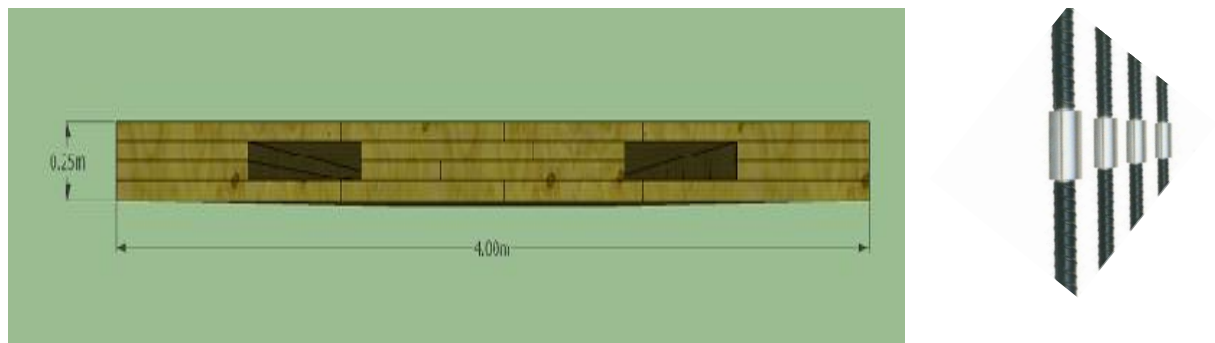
(a) Cross section and LVL shear wall (b) MacAlloy bars with couplers
